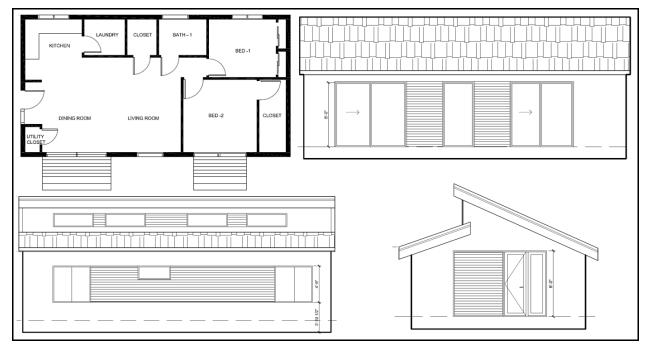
Proposed Type 2 Manager Unit – Floor Plan and Elevations
